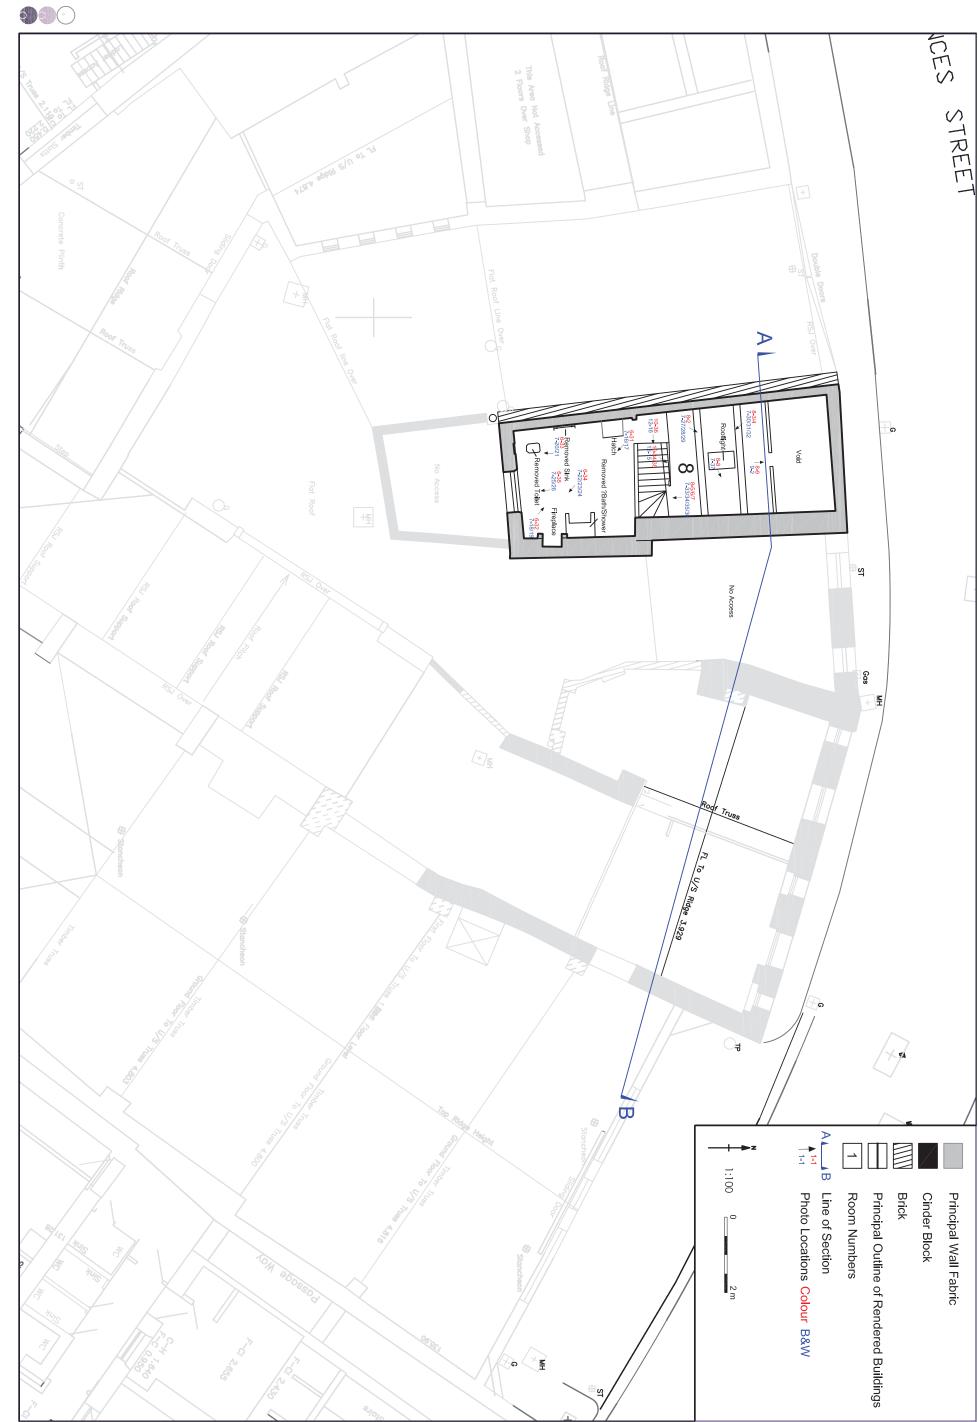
Second Floor Plan of Numbers 9-12 Princes Street
